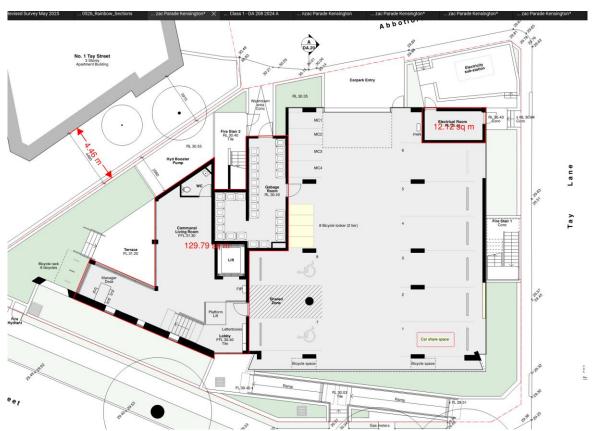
Total Floor Area for the Ground Floor Level (141.91m²)
